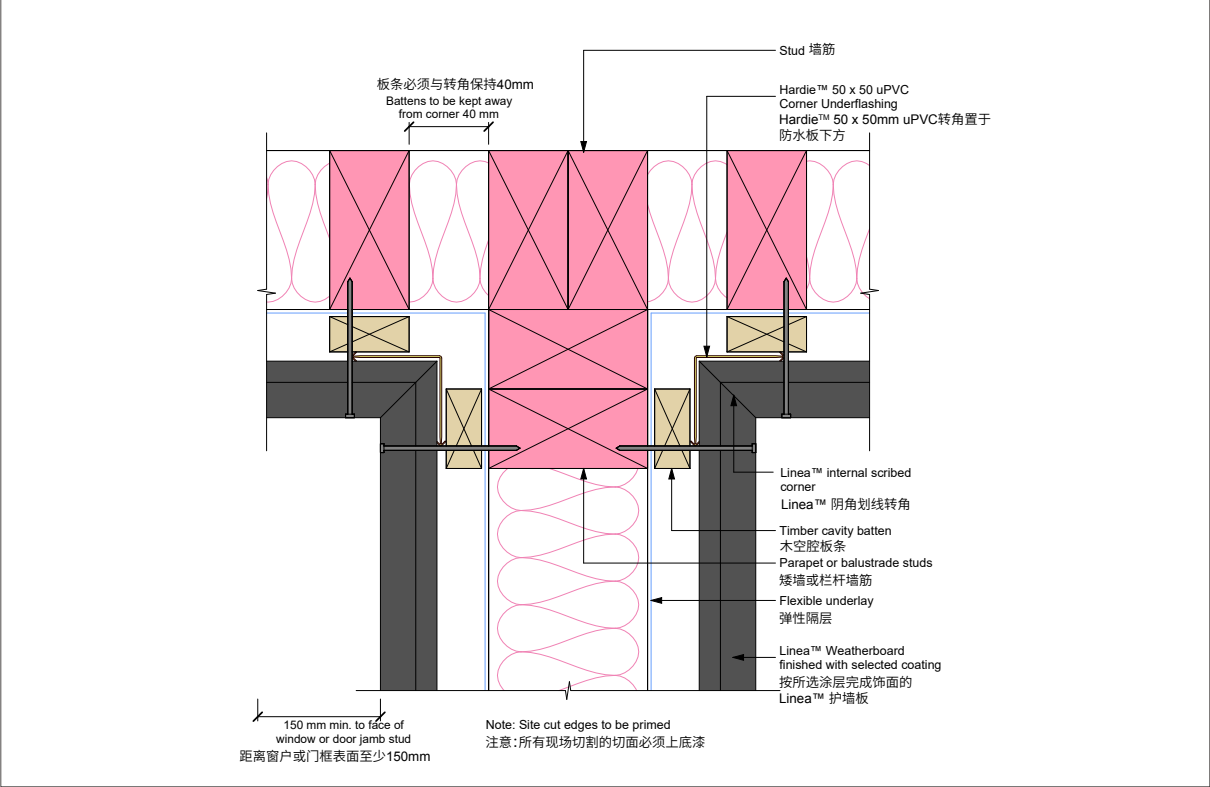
Timber cavity enclosed balustrade to wall | 图33: 木空腔封闭栏杆到墙体
